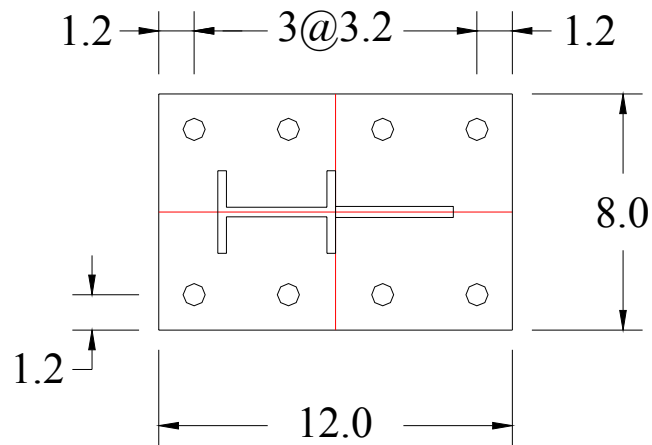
Details of the ground-level brace-to-column connection and the column base plate.
